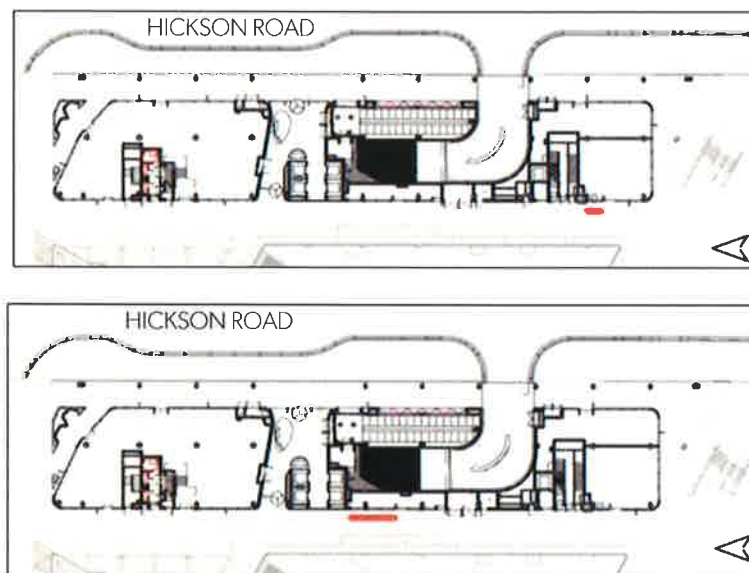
| Proposed Retail Zone D (above) and Retail Zone E (below) shown by the red line (Source: Applicant)
